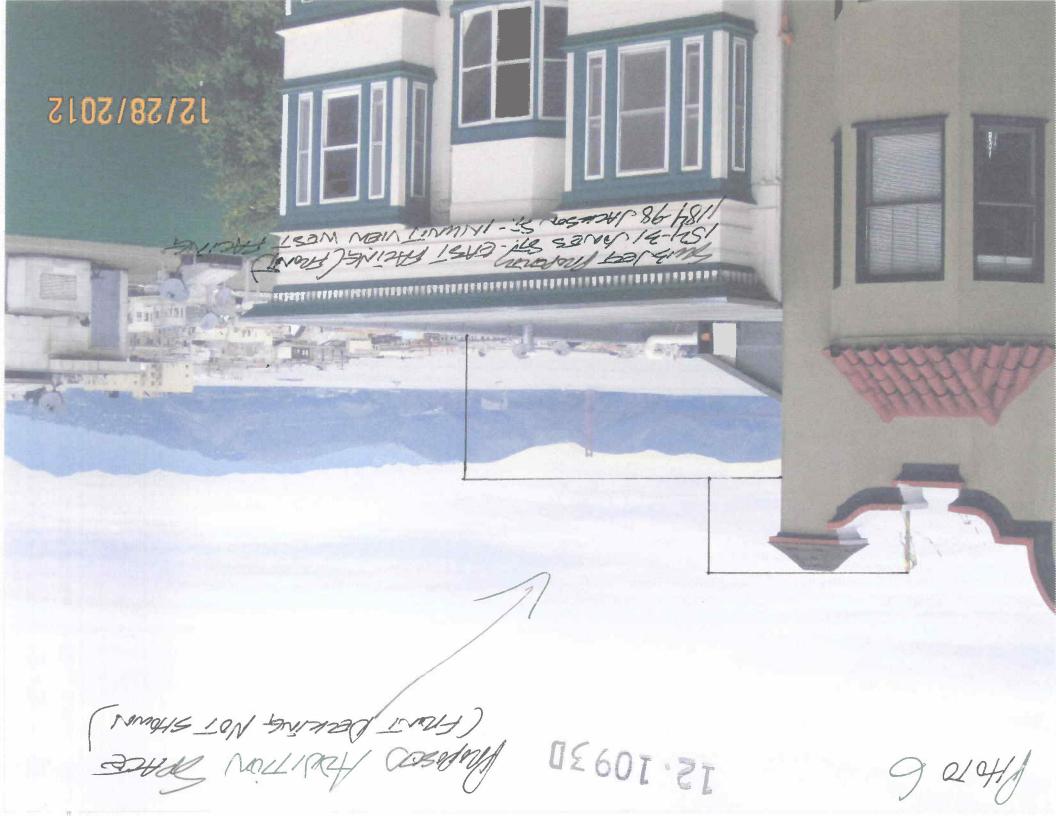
PHOTO # Proposes ADDITION SPACE 12.10930 Subset Proposer 1521-21 Jones S. WEST FACING SIZE (REAR) 12/28/2012
